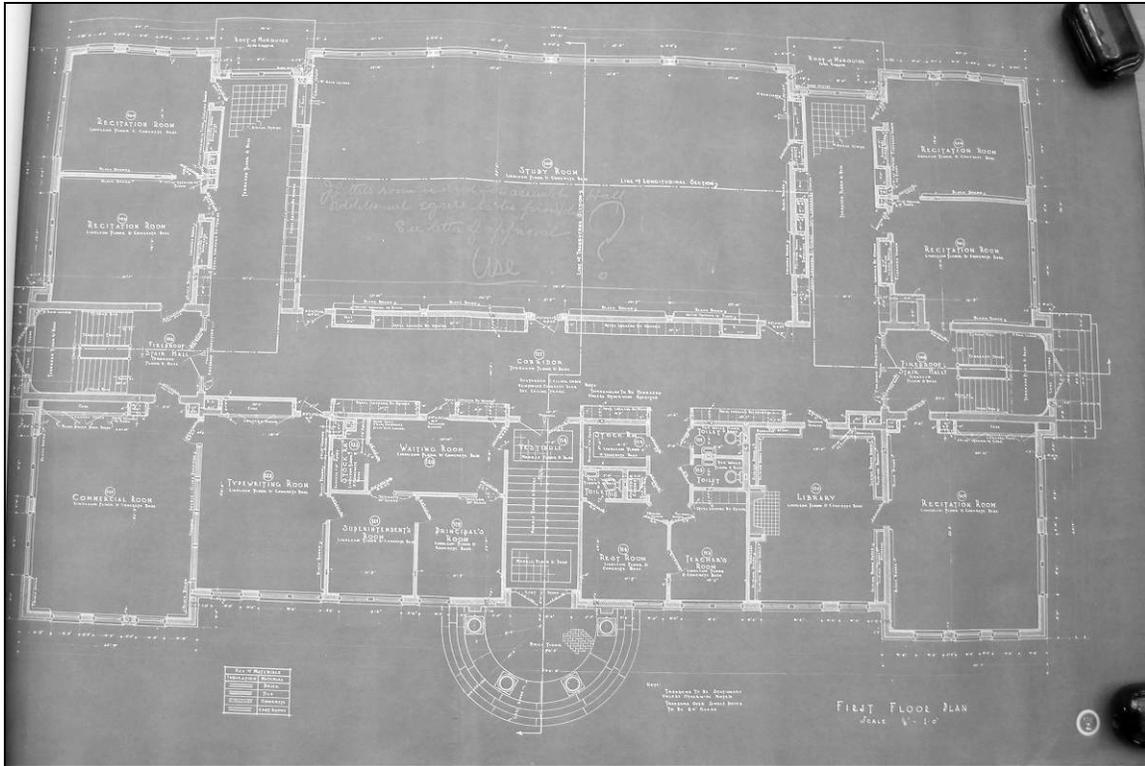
First floor plan, Draper High School, Hopedale, Massachusetts, 6 June 1927. Department of Public Safety, Division of Inspection, Plan Record, Massachusetts Archives.
